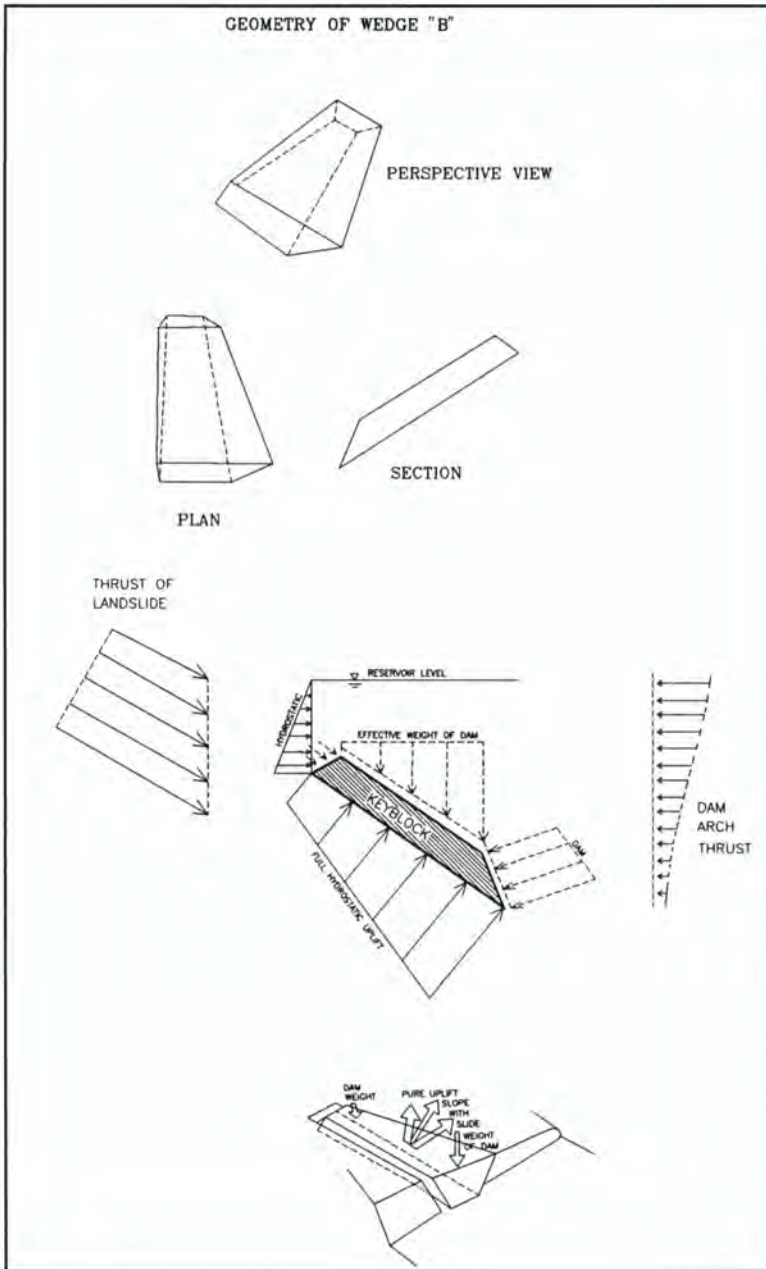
Plan, section and perspective views of keyblock "B", shown schematically in Figure 13. The section view parallels the schist foliation, the lower face that of the abutment excavation. The lower view shows an approximation of the loads that were likely acting on this and adjacent wedges beneath the east abutment after the maximum reservoir pool was attained five days preceding the failure. A simple stability analysis suggests that two-thirds of the lake's full reservoir head would have been sufficient to have lifted this block, with the dam upon it, the same manner of failure by which Malpasset concrete arch dam later failed in 1959.
